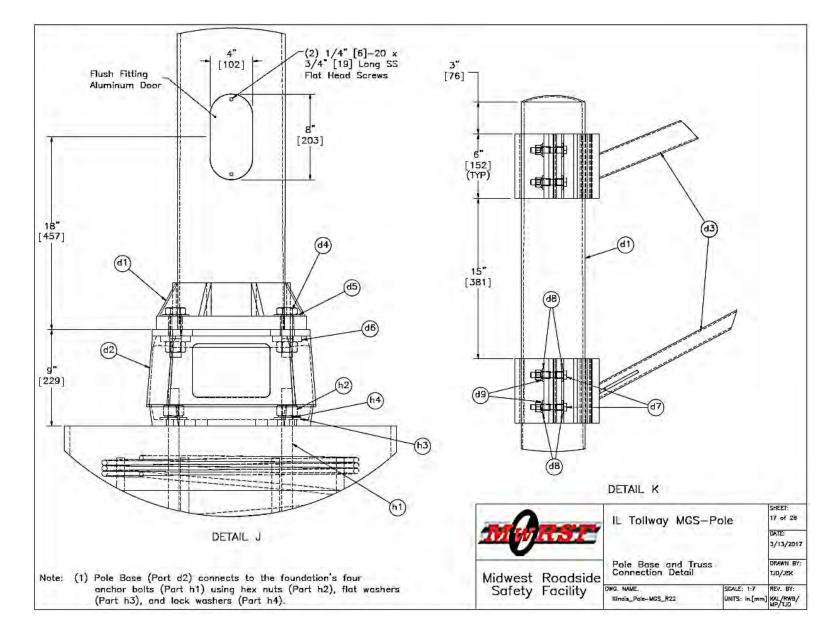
Pole Base and Truss Connection Detail, Test No. ILT-1
